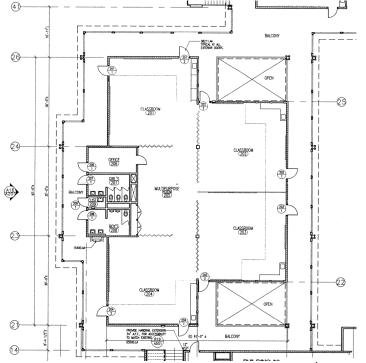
BUILDING 3: 1998 Modernization 2nd Floor Plan
